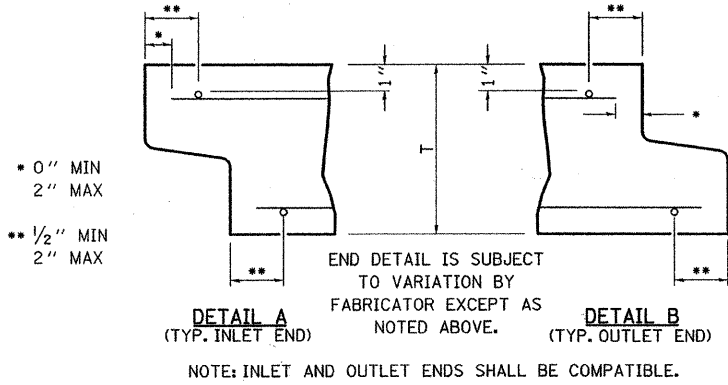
# DETAIL OF PRECAST CONCRETE BOX CULVERT ASTM C1577
